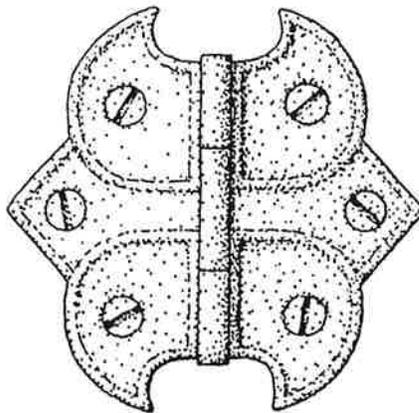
Type of hinge found on chicken house windows and hen doorway (not to scale).
